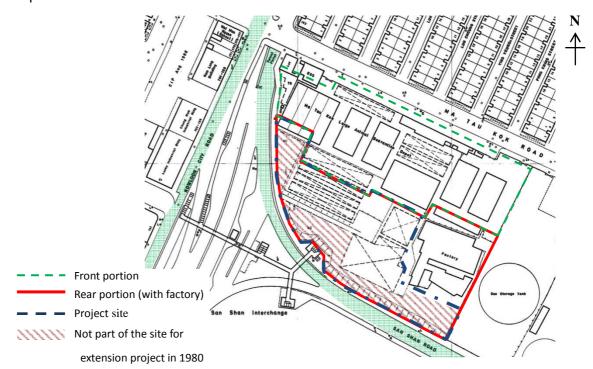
1980 survey plan of the cattle depot (with San Shan Road and Kowloon City Road highlight in green)
